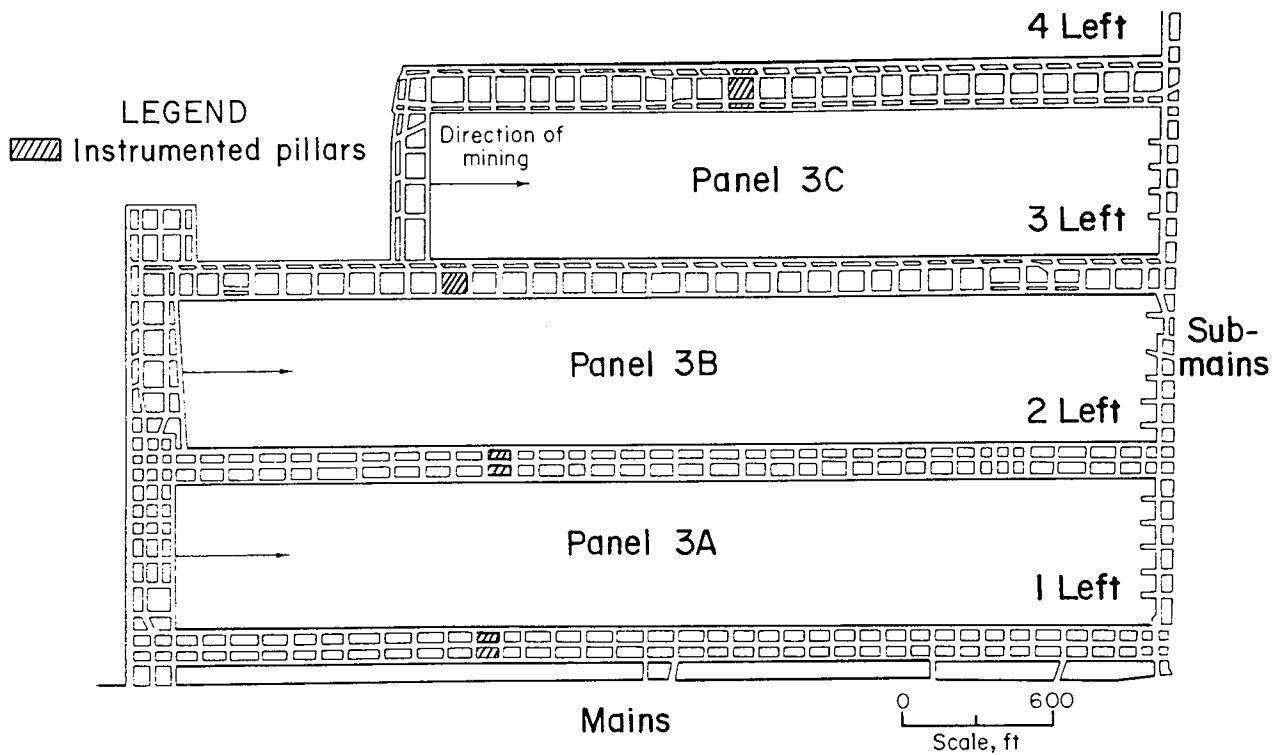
Panel layout and instrumentation sites at mine B (after Listak (69)).
